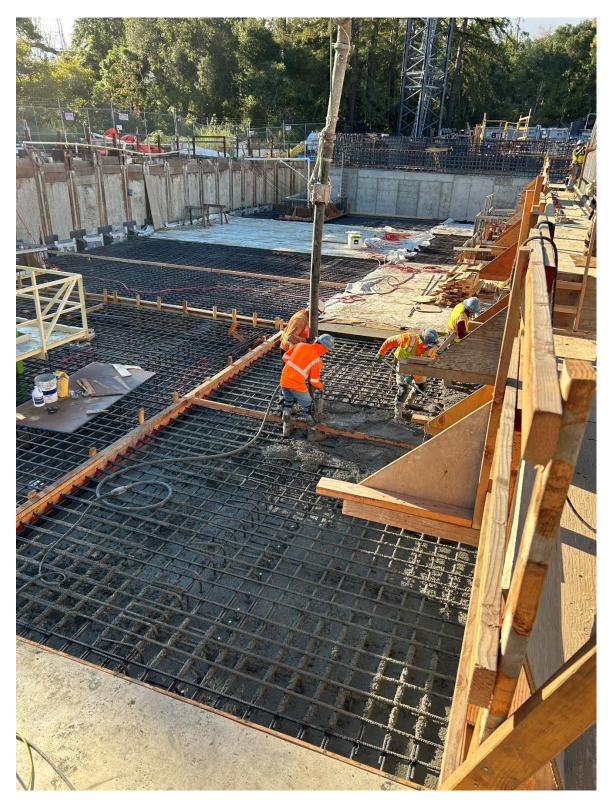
Placing concrete over reinforcing steel for the CCB roof deck.
